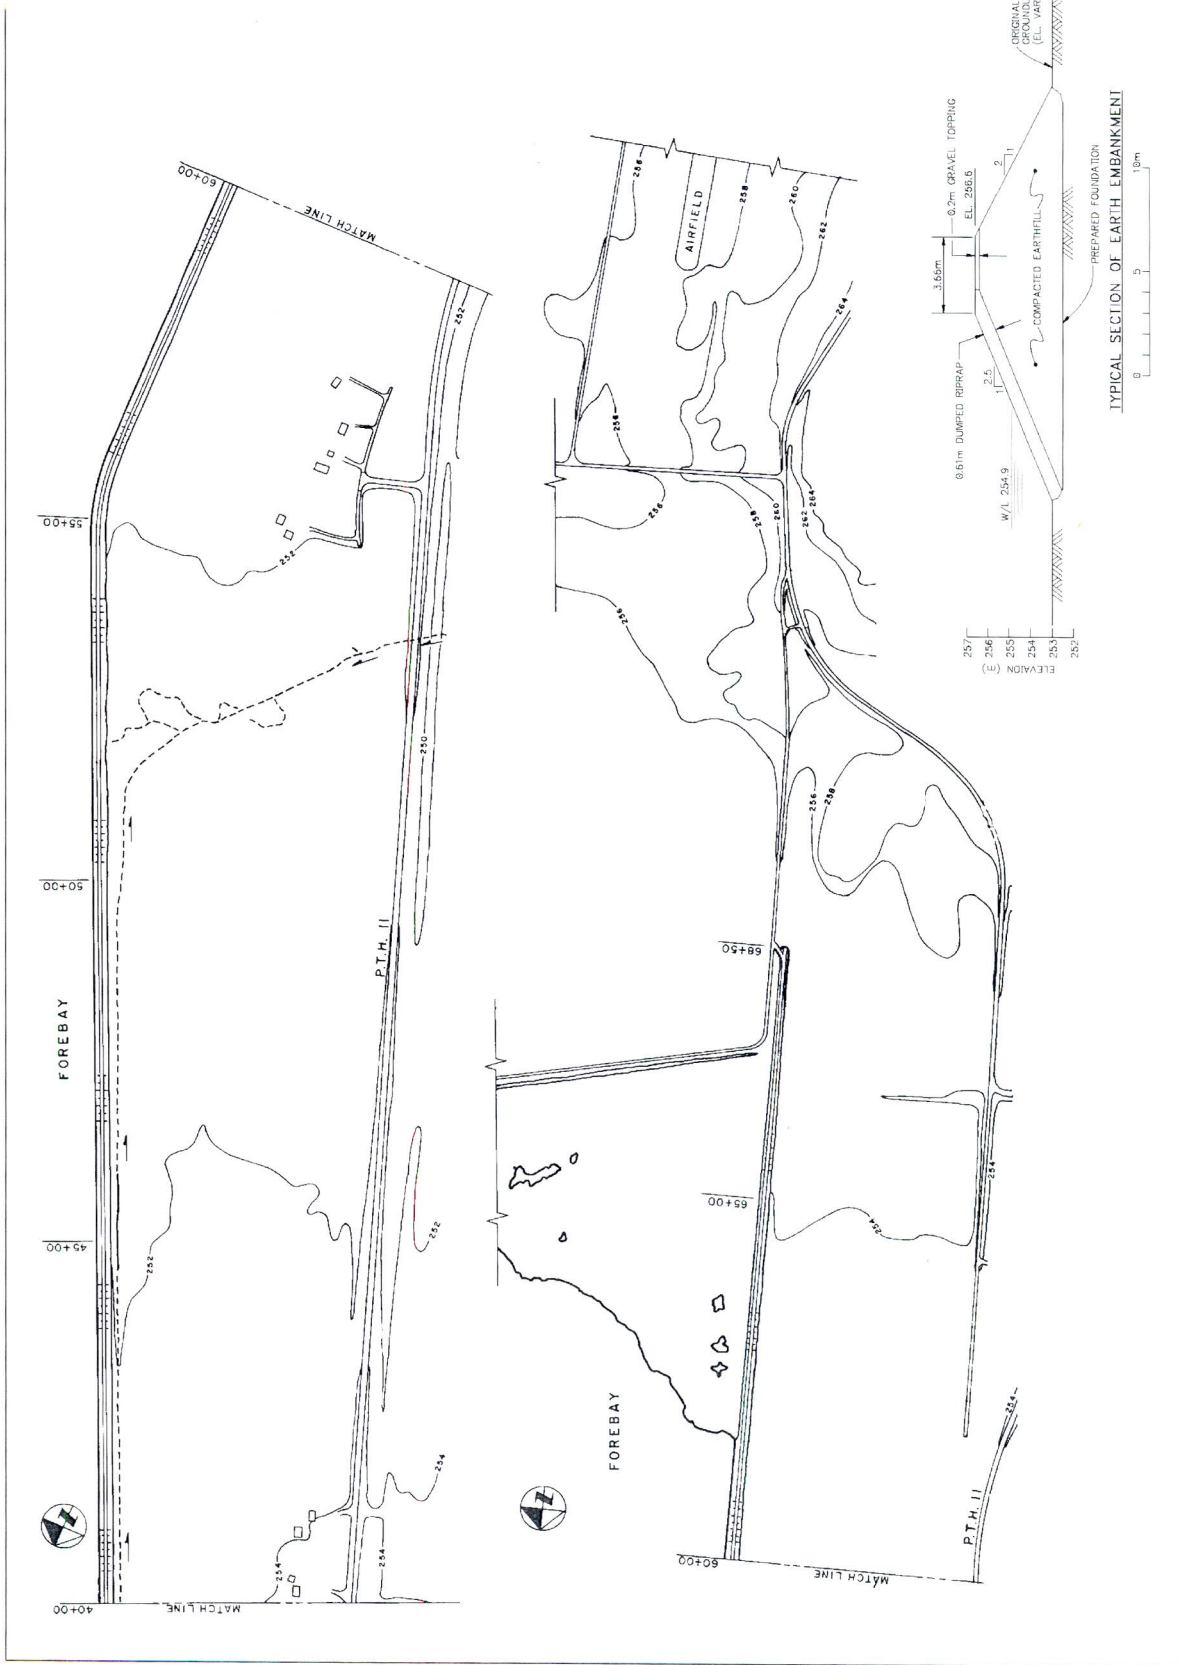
17W Dyke Con't - Plan and Typical Cross Section
